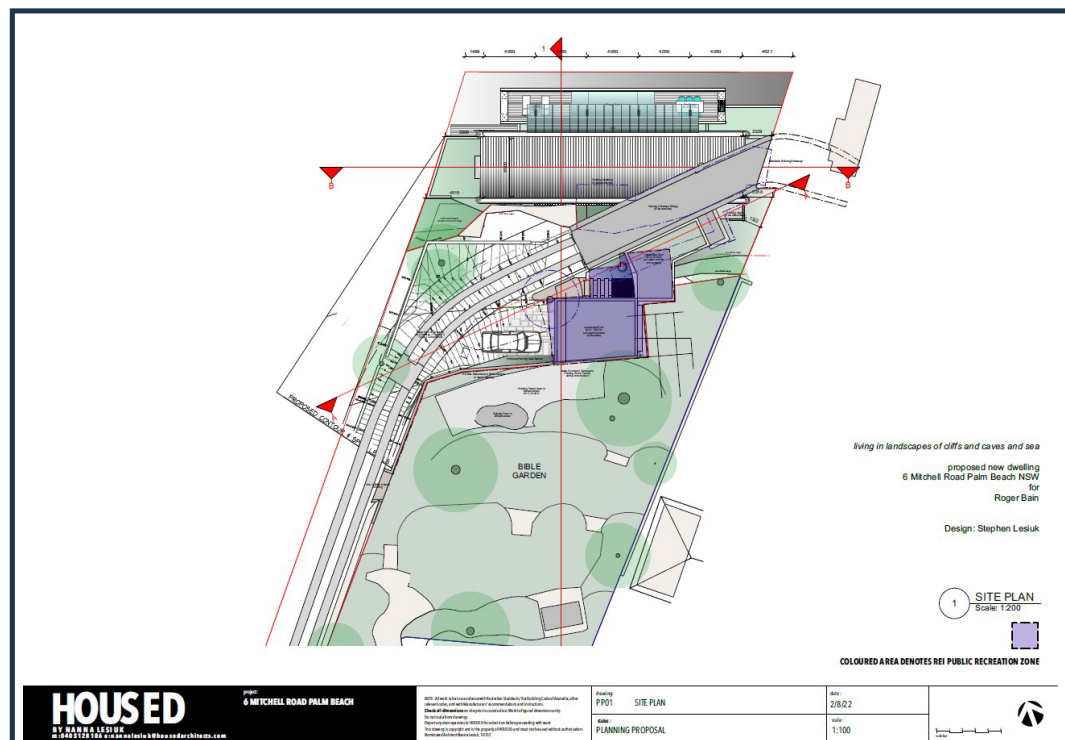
Concept Site Plan with the RE1 zoned portion of the site highlighted in purple (Source: Housed Architects)
